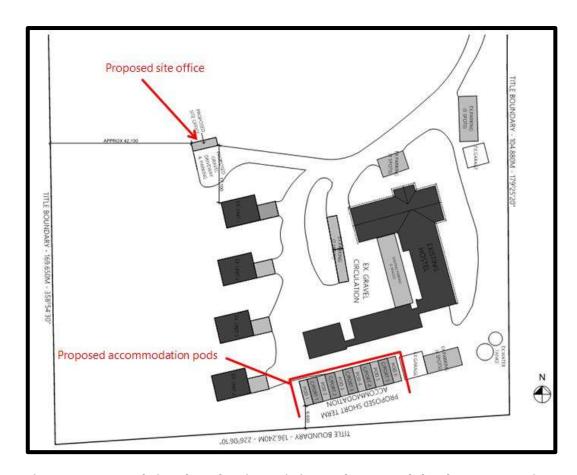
Proposed site plan, showing existing and proposed development (Design to Live, 2017)
